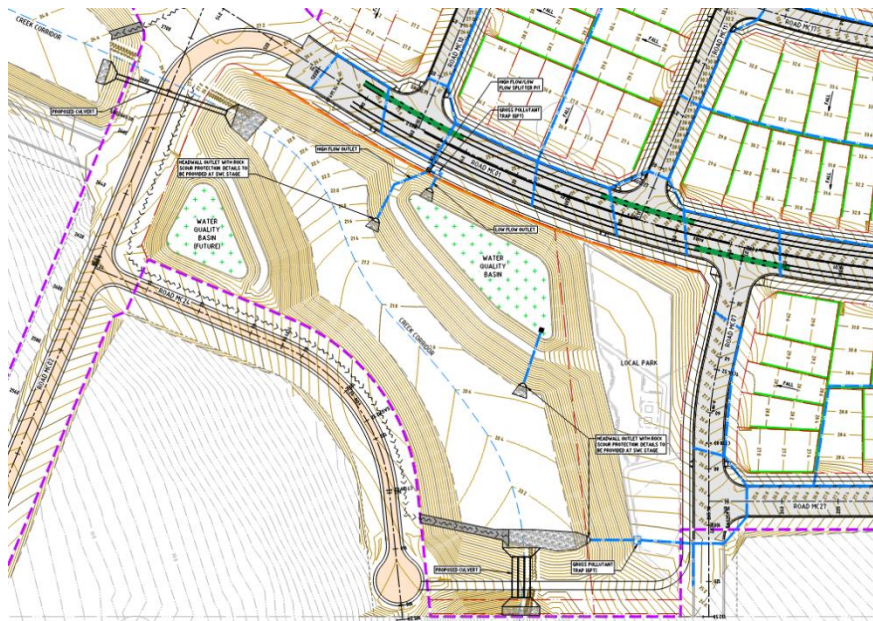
Riparian corridor development including stormwater drainage basins and local park
